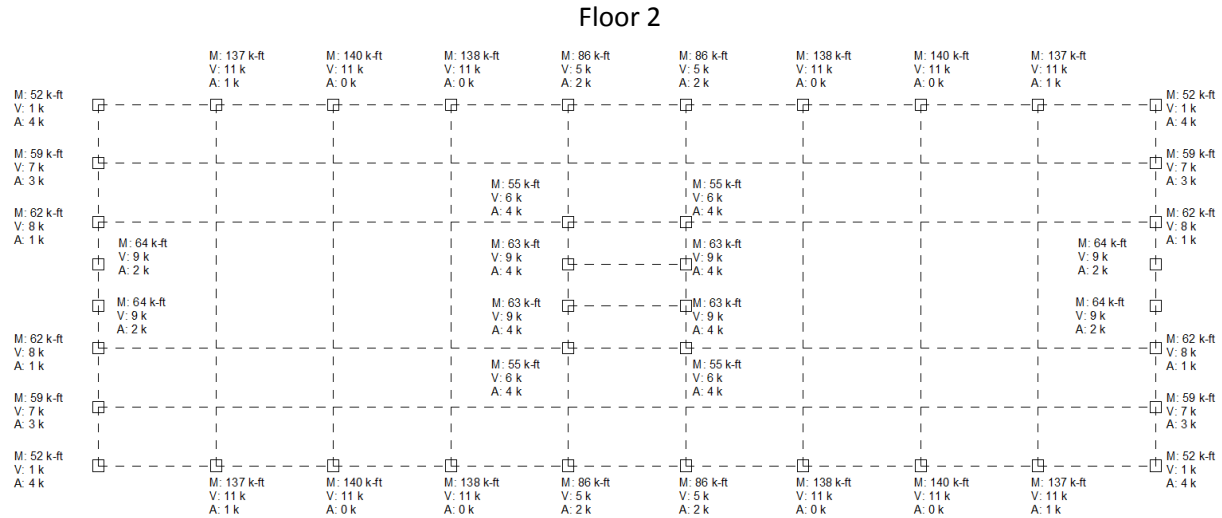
Maximum forces in the second floor columns due to tsunami base shear
